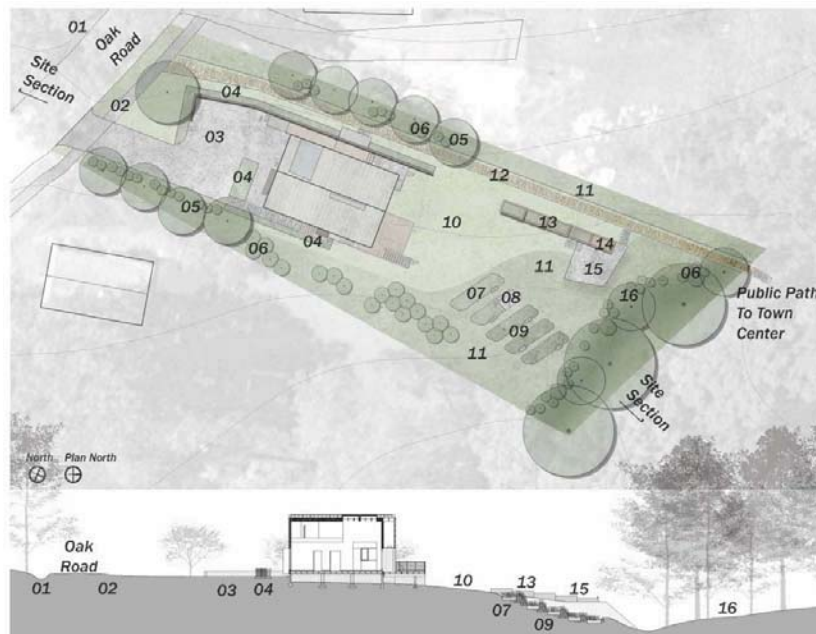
Site Plan and Section. 01 Existing Swale; 02 Sidewalk; 03 Parking Court/Site of Original Demolished Home; 04 Perennial Bed; 05 Small Native Trees; 06 Native Shrubs; 07 Greywater Treatment Bed; 08 Forebay/Rainwater Inlet; 09 Rainwater Infiltration Beds; 10 Drought Tolerant Turf; 11 Native Grass Meadow; 12 Crab Orchard Stone Community Path; 13 Raised Vegetable Beds; 14 Irrigation Cistern Enclosure/Hand Pump; 15 Gravel Patio and Fire Pit; 16 Existing Swale/Forest.
